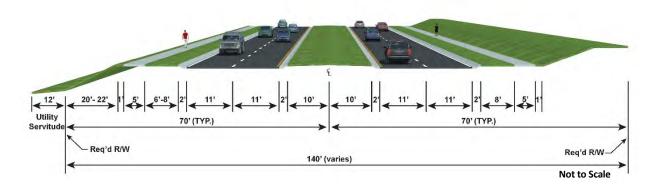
Typical Roadway Section, Urban Collector - 1 (UC-1) Dijon Drive Extension Four-Lane Roadway with Raised Median (24 feet wide) and Sidewalks
